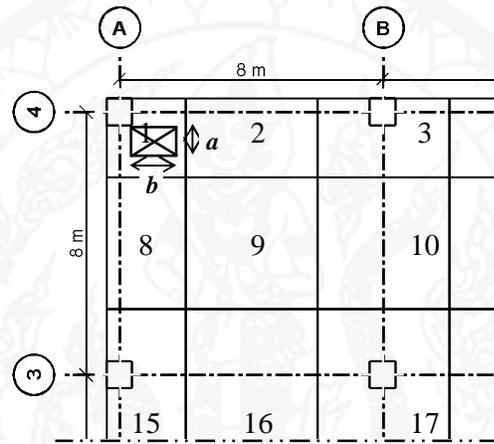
Flat plate model with opening at the corner of corner column [O-10]
